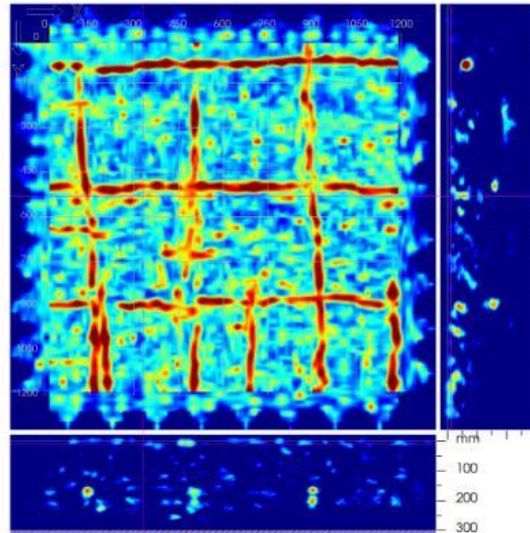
Rebar mapping and detection of voids and anomalies in GPR Scan of Retaining Wall
